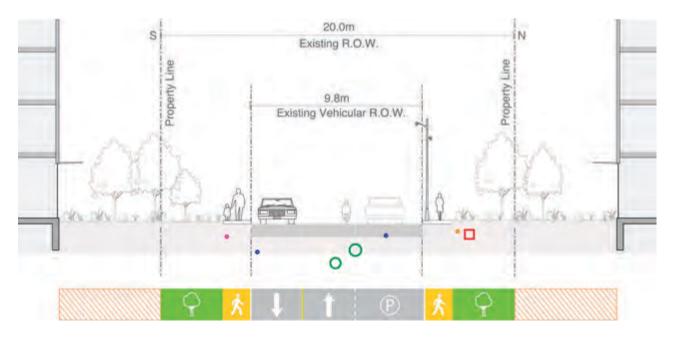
Section of the Existing Conditions of Broadway Avenue between Redpath and Mount Pleasant Road
